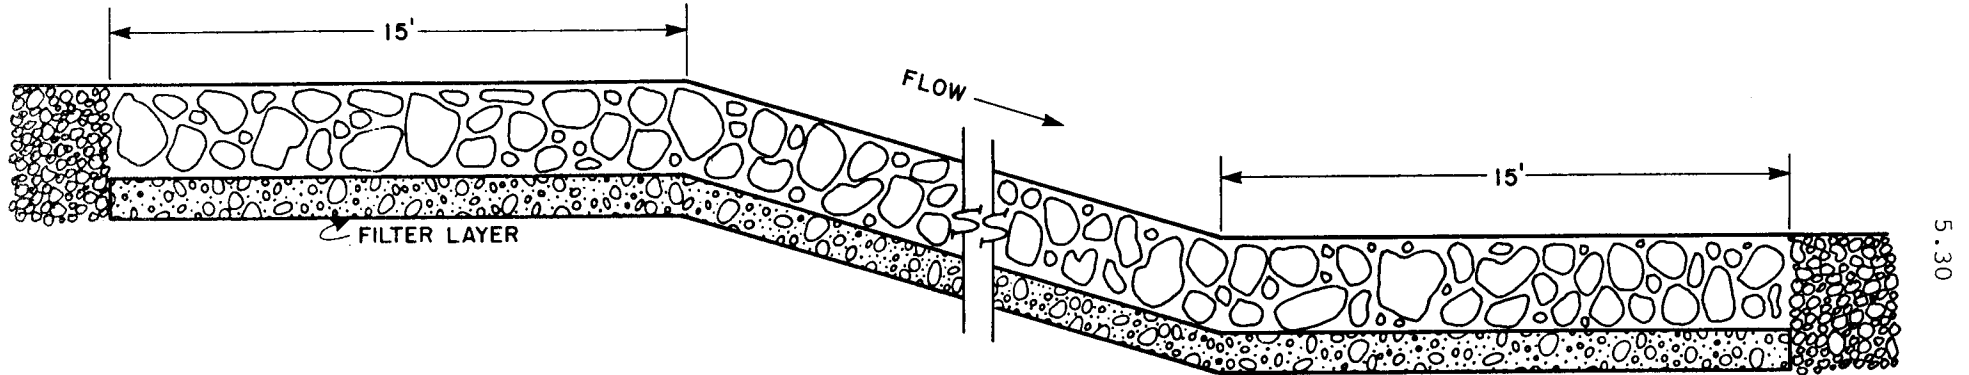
Entrance and exit protection on steep conveyance channel.
